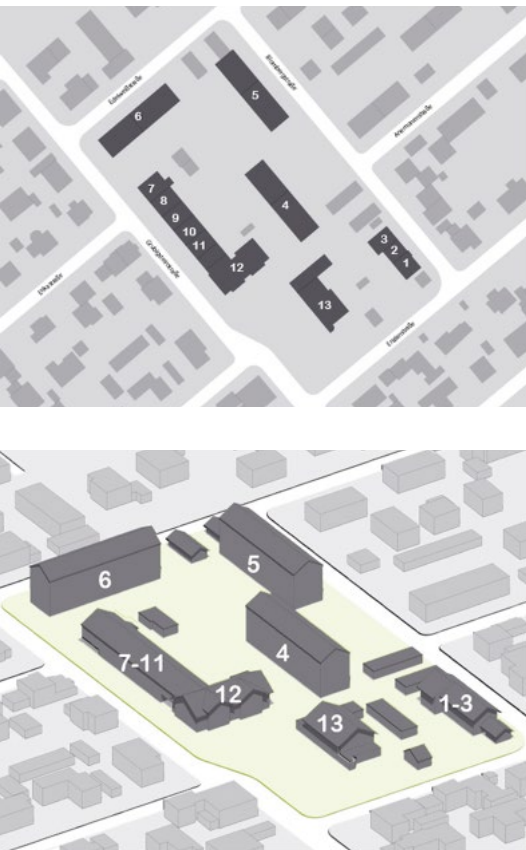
Site plan and 3D visualisation of the case study site (Khoja 2014)
